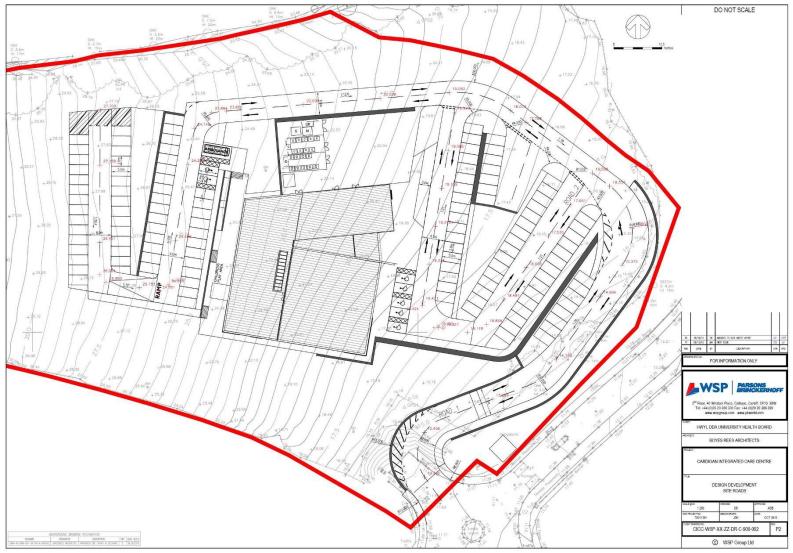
Proposed layout plan of Cardigan Healthcare Centre as supplied by client
